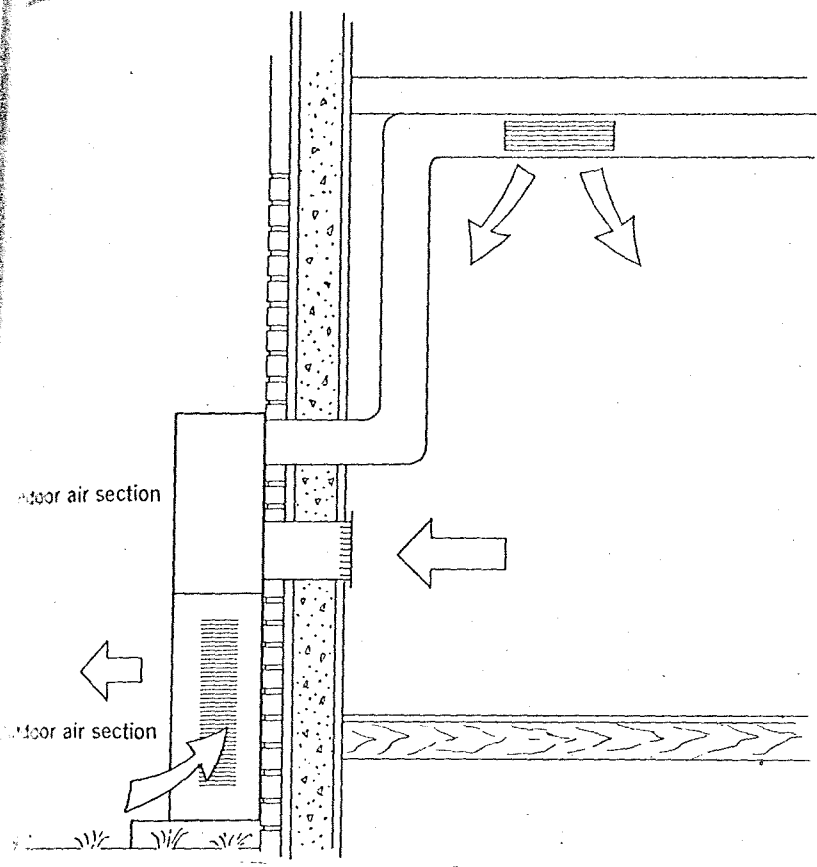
A vertical cabinet, single package type heat pump mounted outside on wall or slab.
